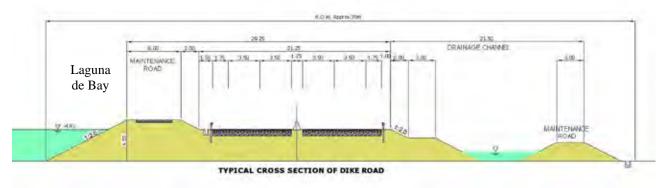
TYPICAL CROSS SECTION
